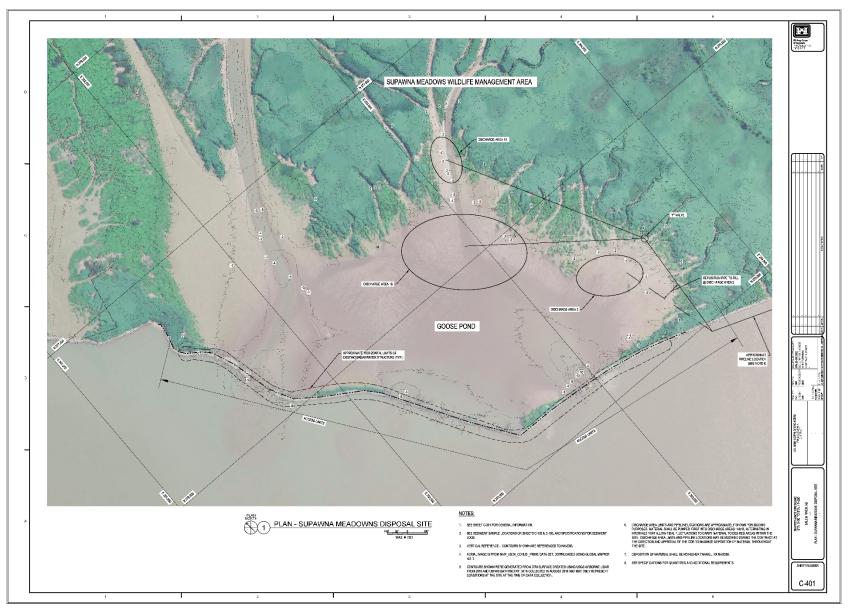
Salem River Federal Navigation Channel Maintenance Dredging Draft Plan – Goose Pond BUDM Disposal Plan
